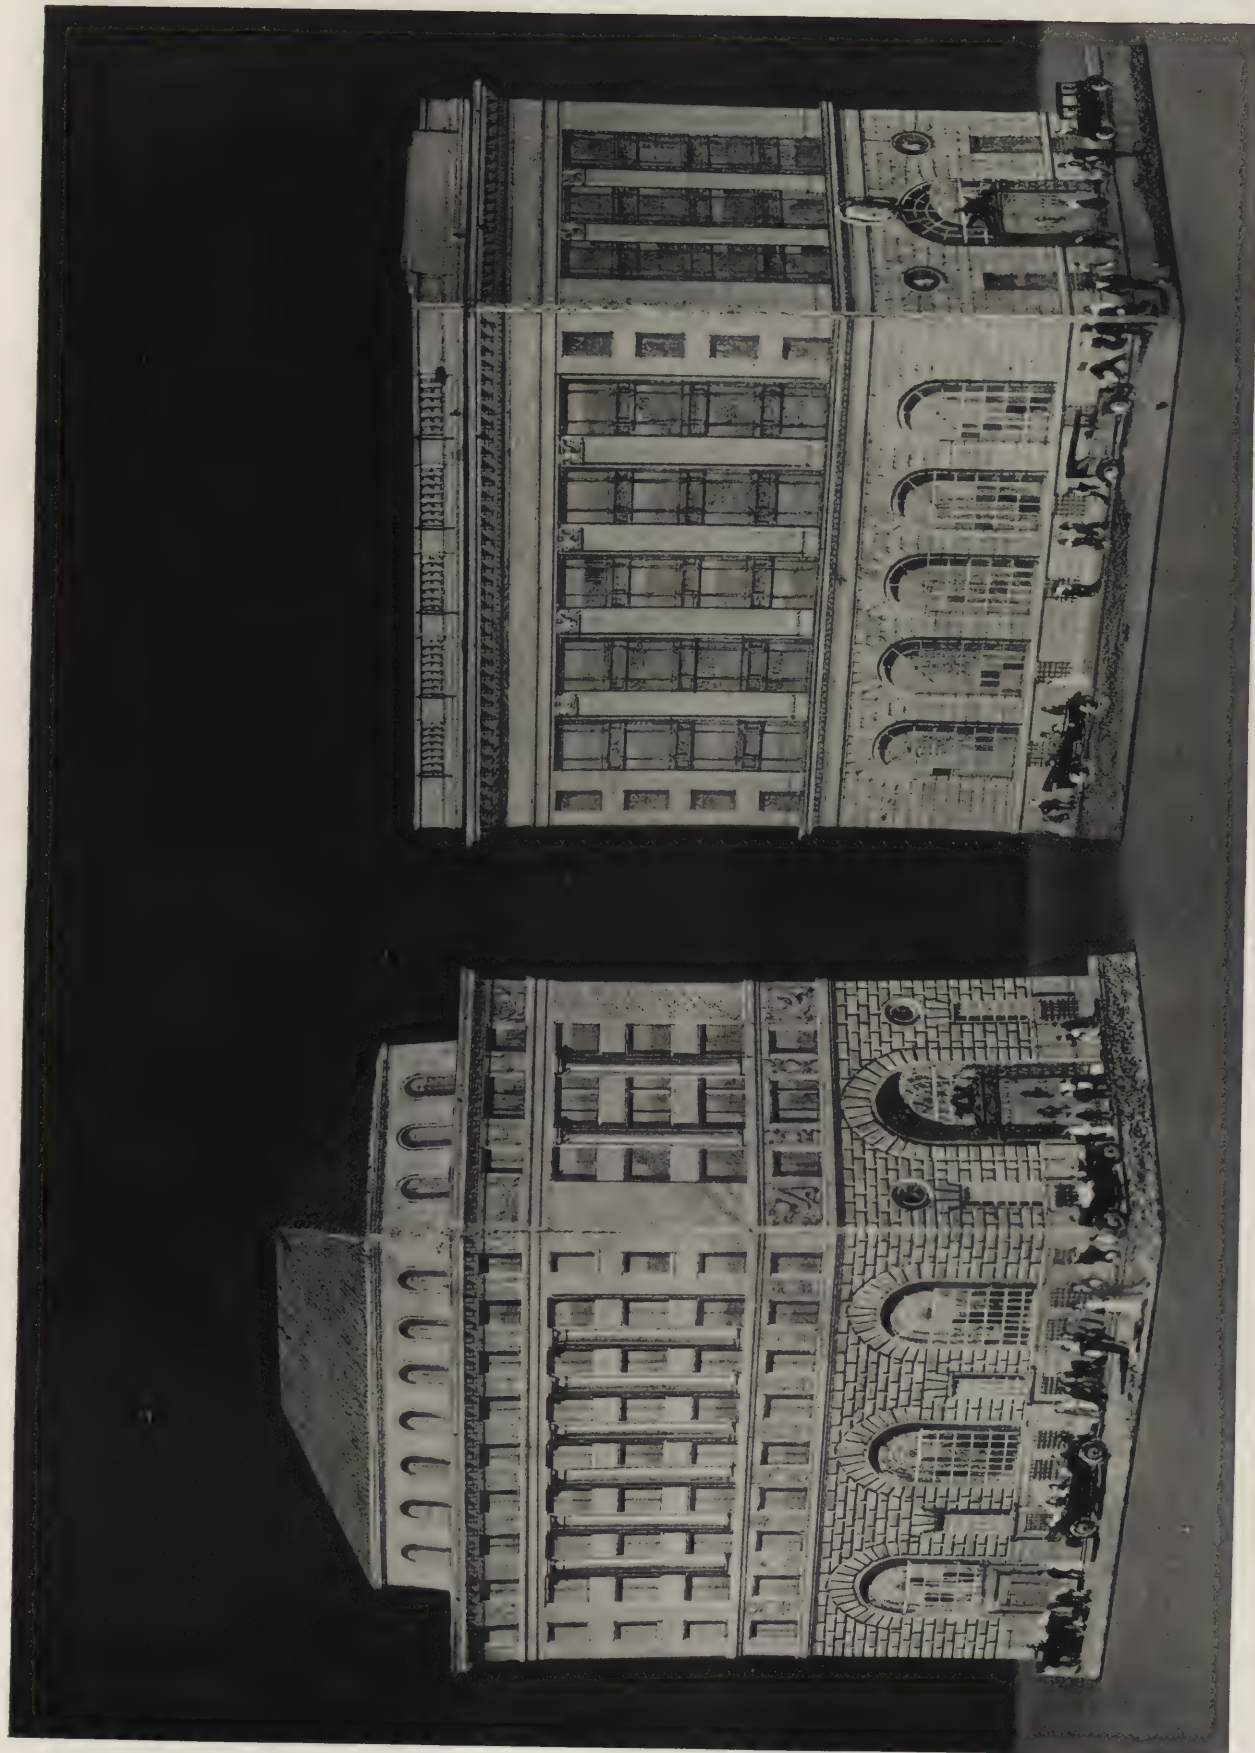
LIGHT CARDBOARD PRELIMINARY STUDIES FOR BANK BUILDING, COLORED AND SHADOWS CAST
